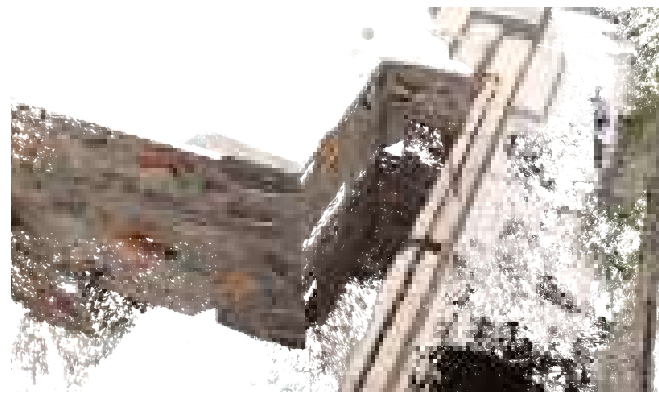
Bird-eye view of Kiva-Bridge (Source: created by authors)
